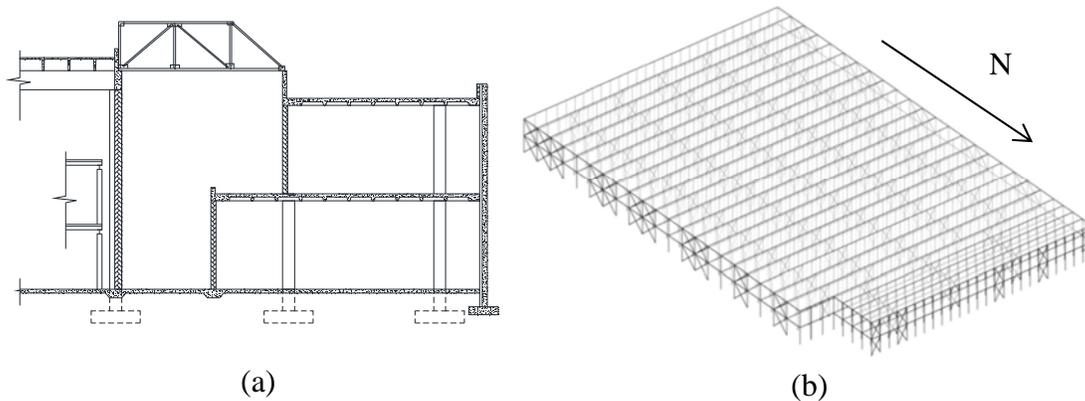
(a) Typical elevation of Pod, Offices and mezzanine; (b) Steel mezzanine inside Pod
